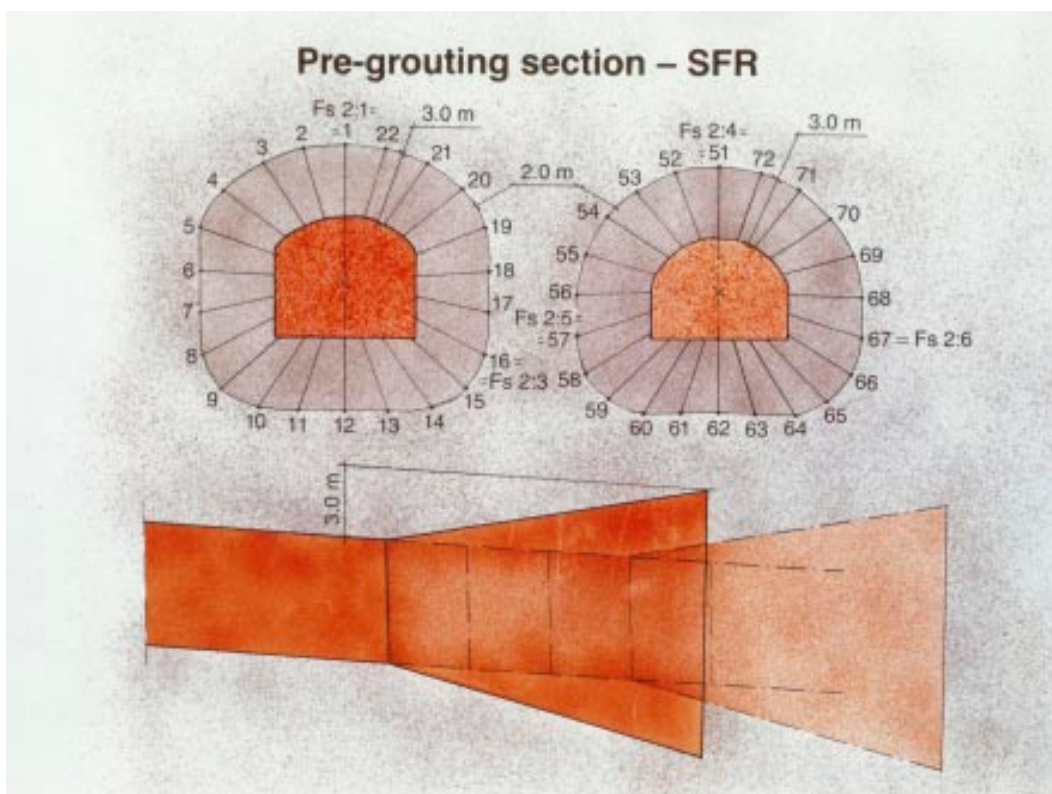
Pre-grouting in section through the Singö deformation zone in the access tunnels, SFR.
